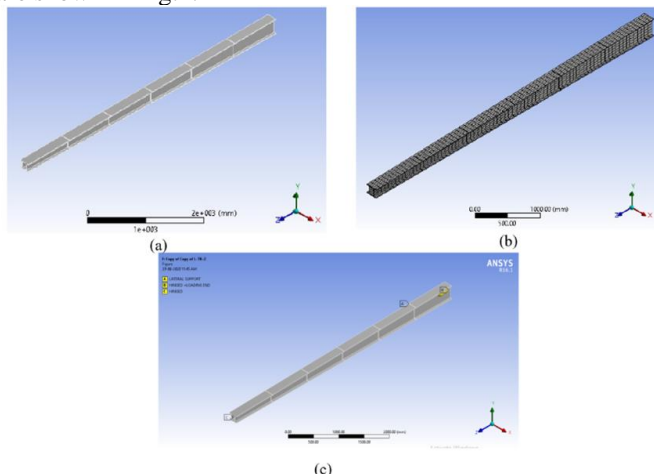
(a) Isometric view (b) Finite element modelling (c) Boundary conditions of tapered column sections
